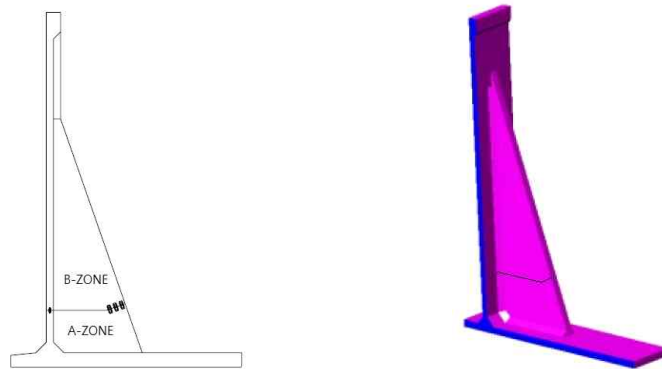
A buttressed retaining wall unit with precast joint connection method(PC Joint method)
